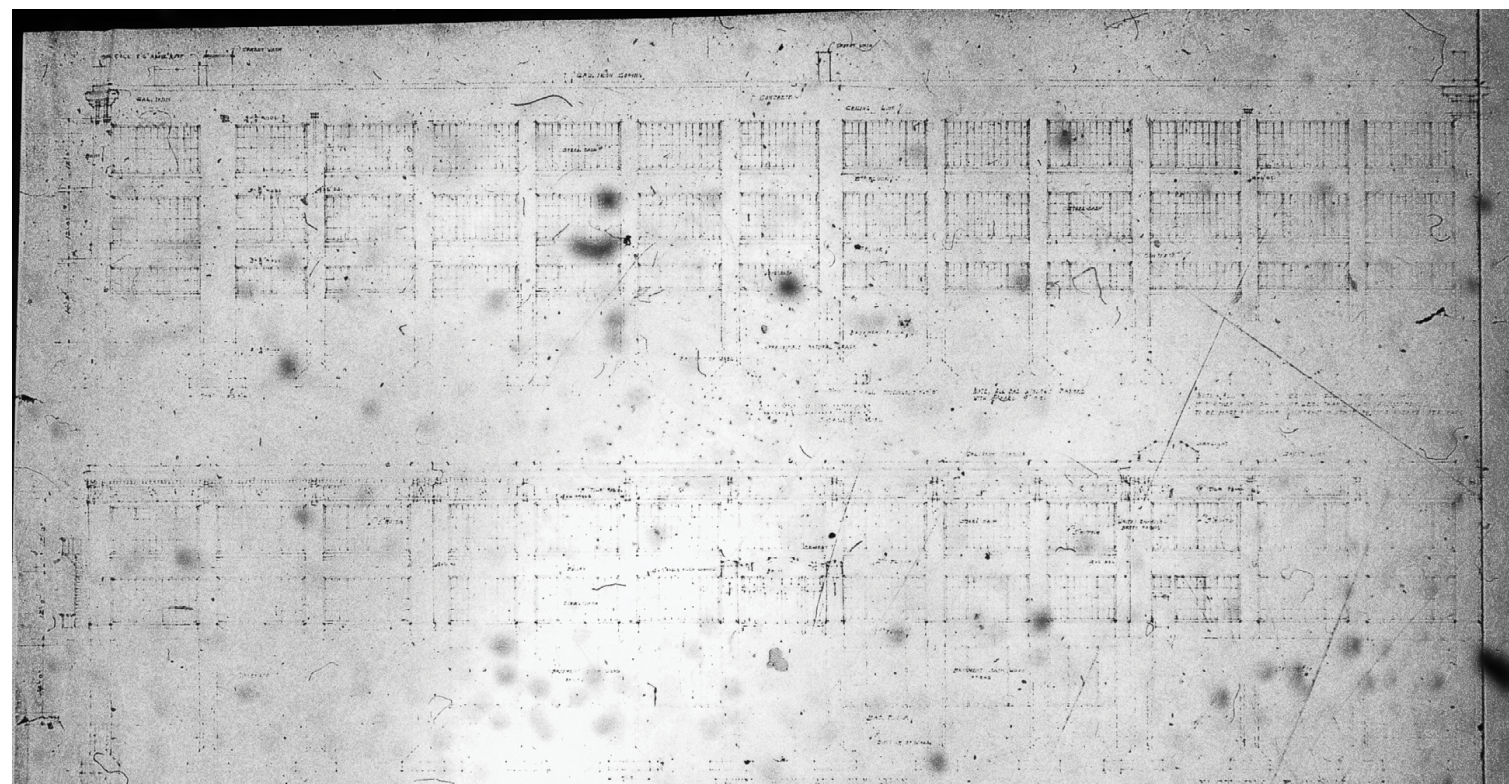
Eastern and western elevations of the Black Manufacturing Building were on file at Seattle Department of Construction and Inspections Microfilm Library. The northern and southern elevations were not available.
